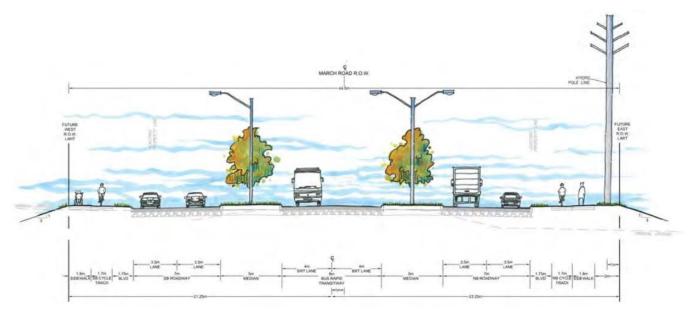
Cross-section of ultimate plan for March Road from Kanata North CDP
